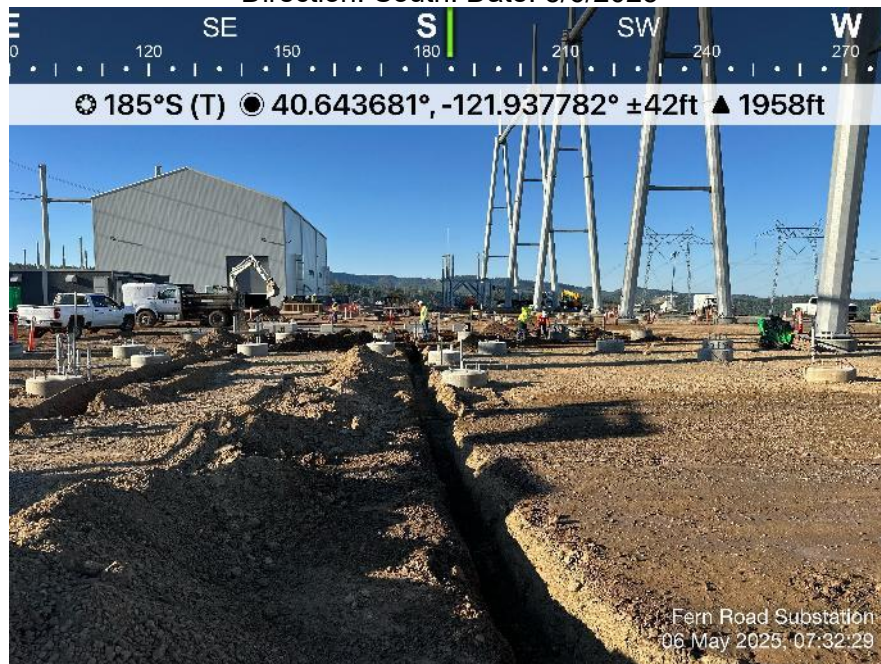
View of TTR crew doing a slurring pour and prepping a foundation form.
